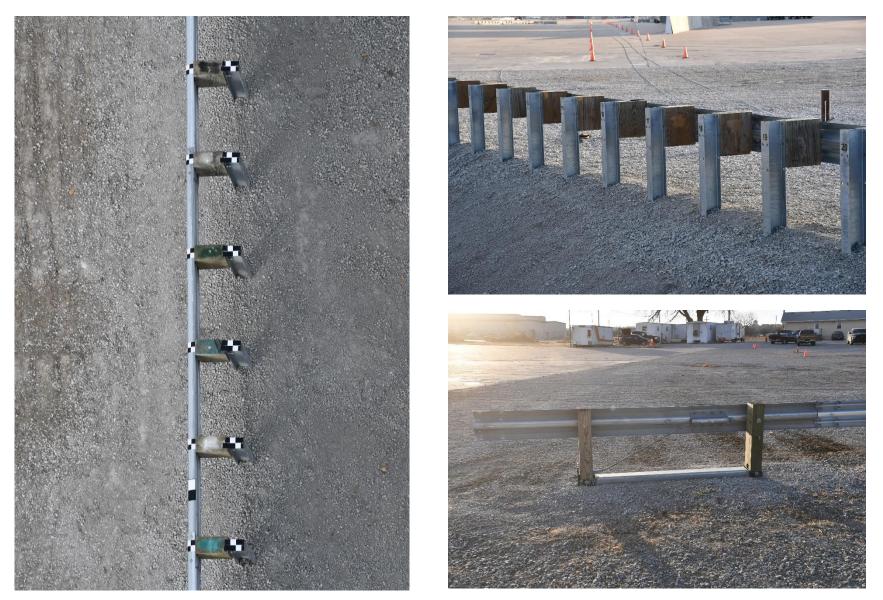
Test Installation Photographs, Test Nos. MGS7S-1 and MGS7S-2
